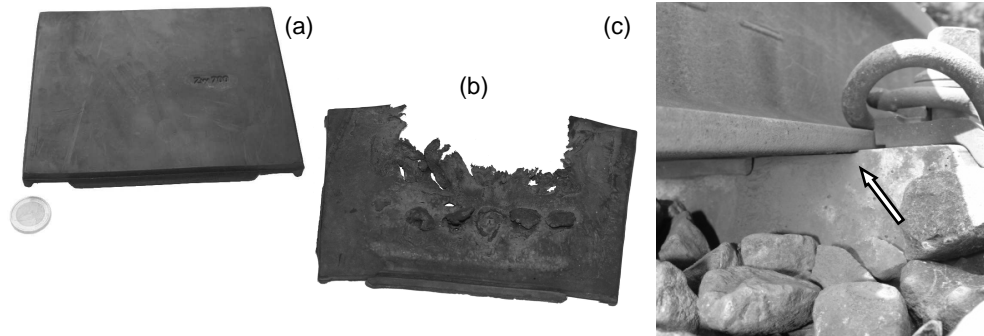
(a) New elastic pad with a 2 EUR coin, (b) an used pad that was removed too late from a regular railway track and (c) starting damage of a sleeper.
